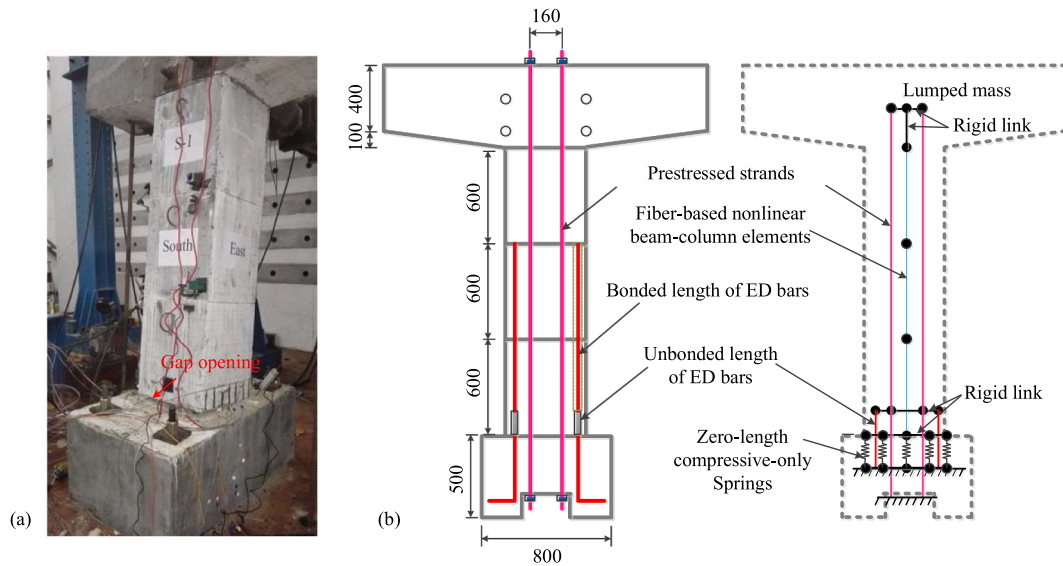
Details of the (a) test specimen (S-1) [47], and (b) finite element model.
